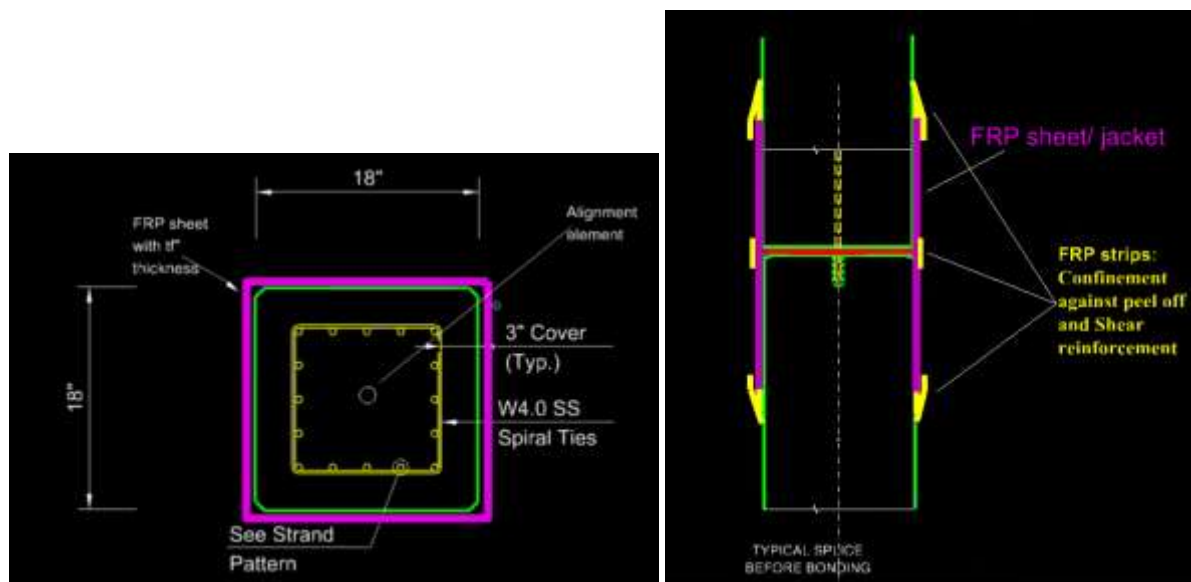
18 in. square prestressed pile spliced with FRP sheet
